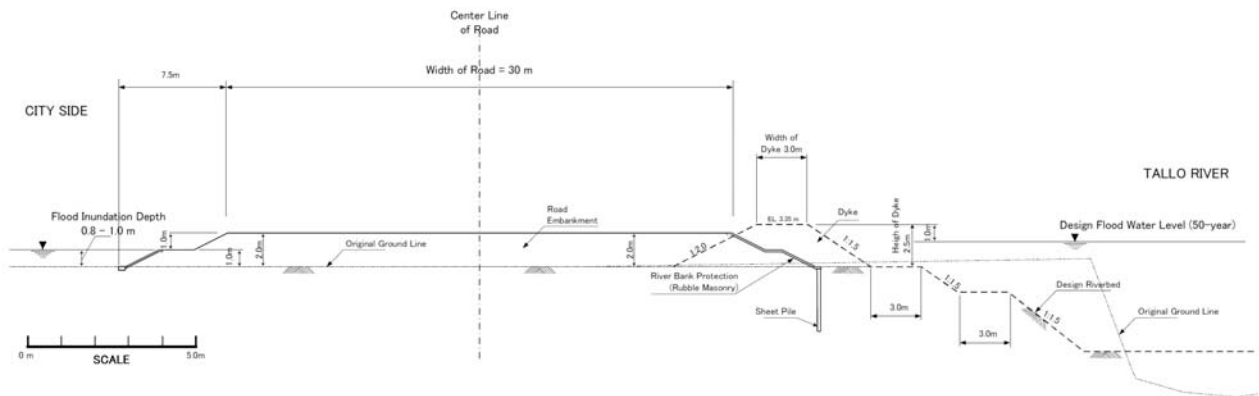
Typical Section of Dyke and Highway along Outer Ring Road
